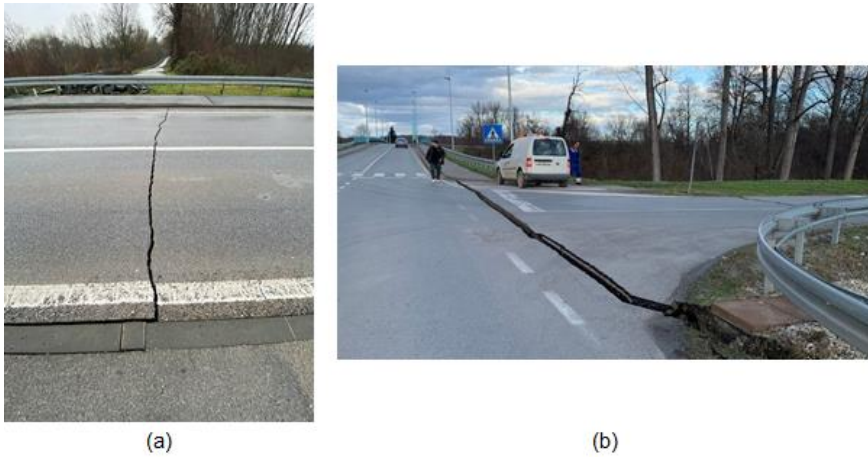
(a) A wide transverse crack at the Brest Bridge approach road
